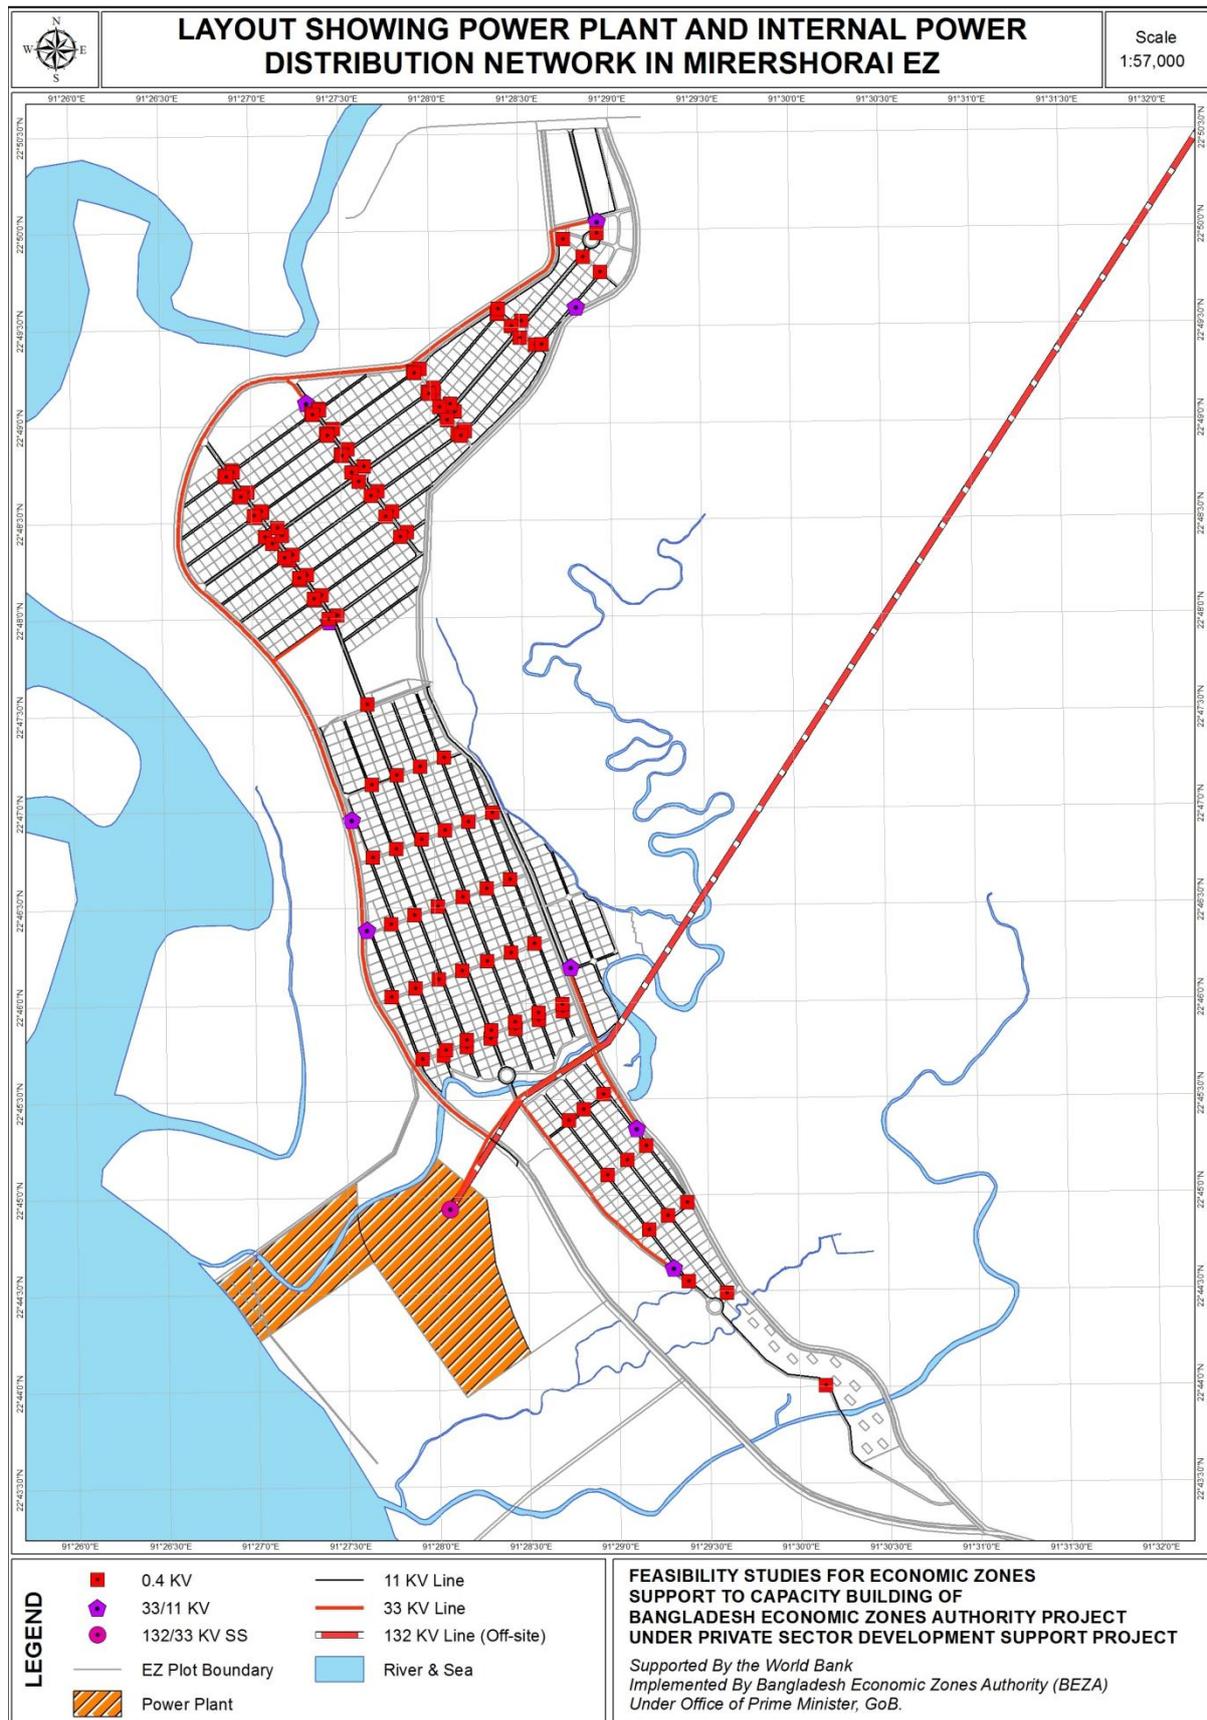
Layout Showing Power Plant and Internal Distribution Network
